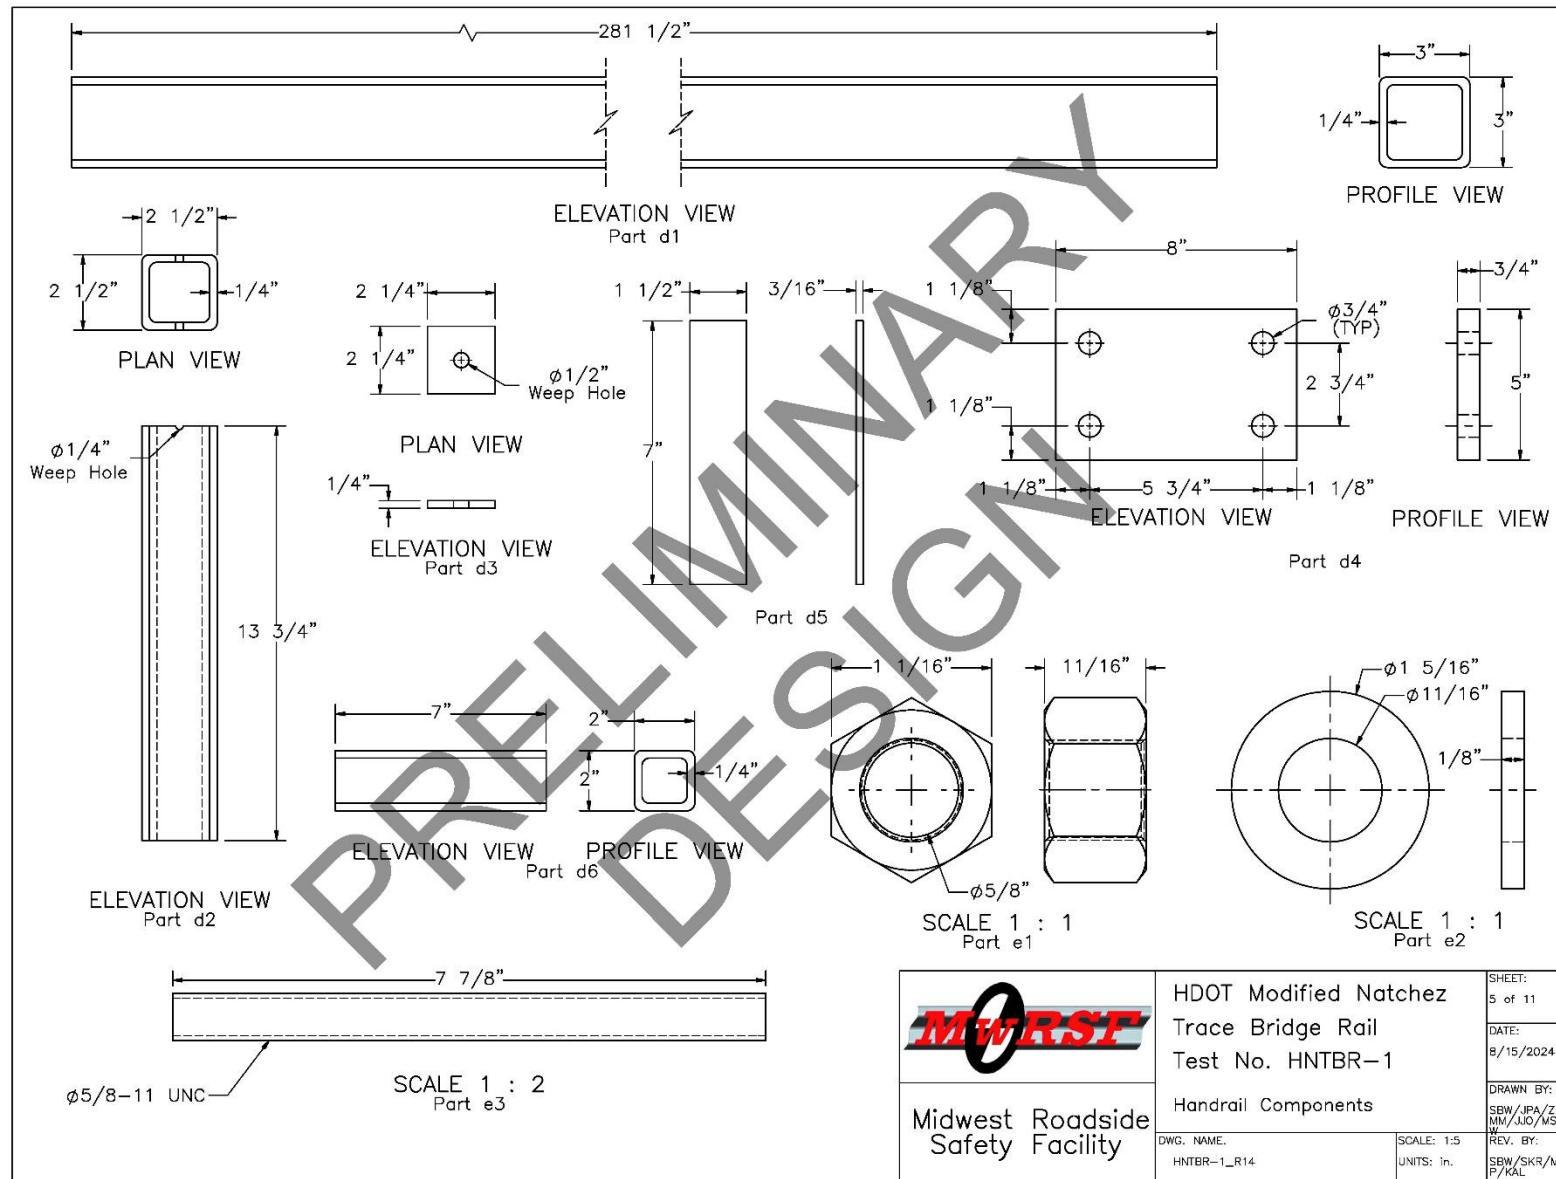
Handrail Assembly Components, Test No. HNTBR-1
